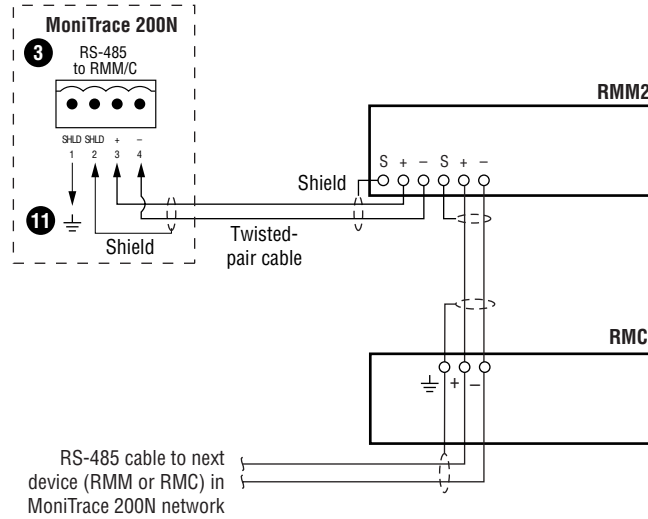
Wiring detail: Connecting RS-485 network of RMM2 and RMC units.
